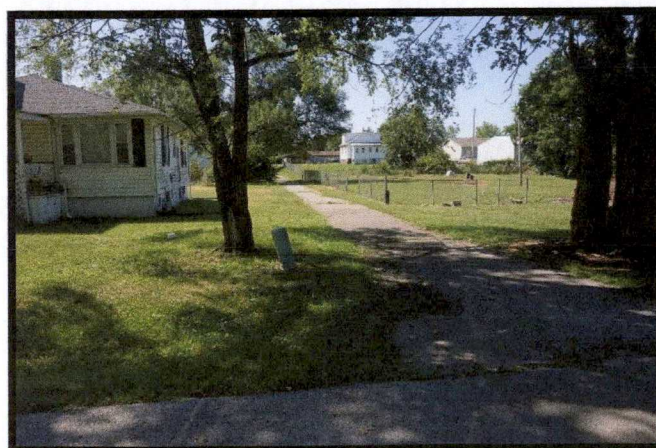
Watson Alley, gravel area (view from Terry Street toward Harrison Street).
